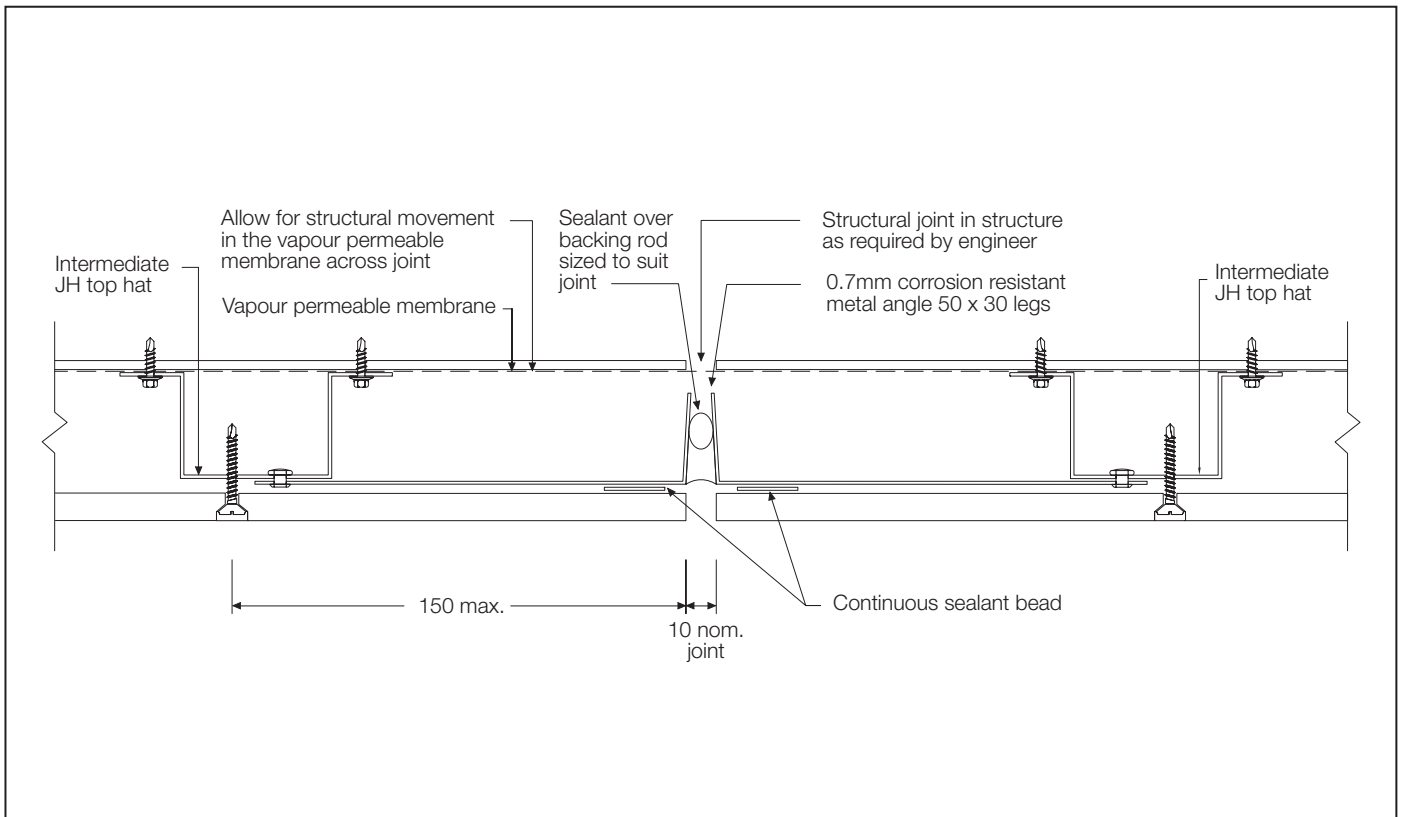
VERTICAL STRUCTURAL JOINT DETAIL
